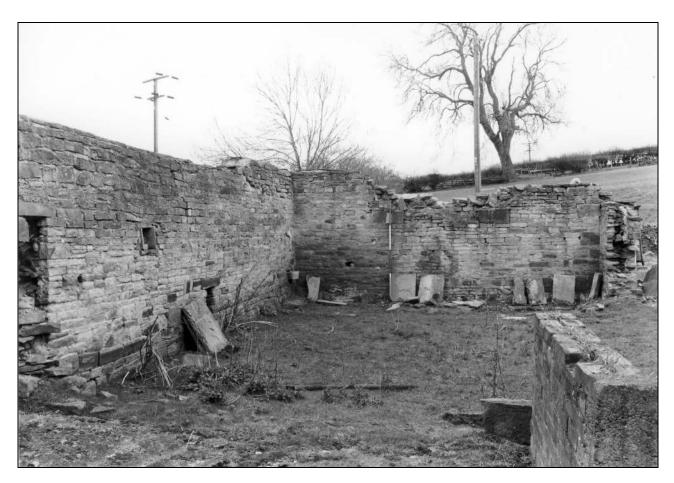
Interior of building 2b, from the north (film 2, frame 15)
